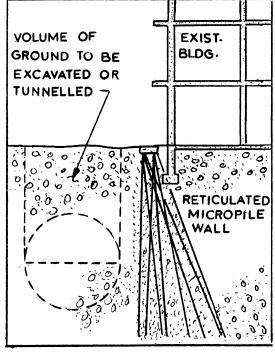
Reticulated Micropile Wall to protect existing structures adjacent to cut and cover, or tunnelling, activities
